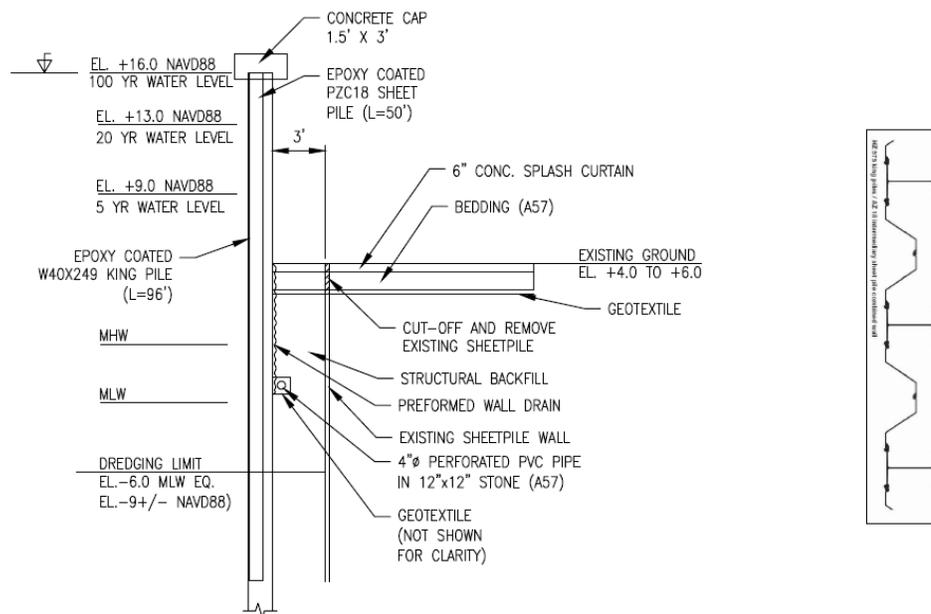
Typical Section – King Pile/Sheet Pile Combi-Wall - Type D
